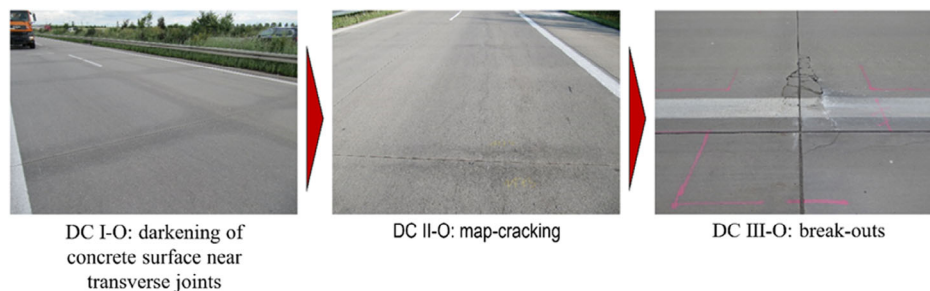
Evolution of ASR damage on the surface of concrete pavement caused primarily by the top layer of concrete. Adapted with permission.^[115] Copyright 2018, Ernst & Sohn. a) DC I–O darkening of concrete surface near transverse joints. DC II O map-cracking, DC III-O: Break Outs.
